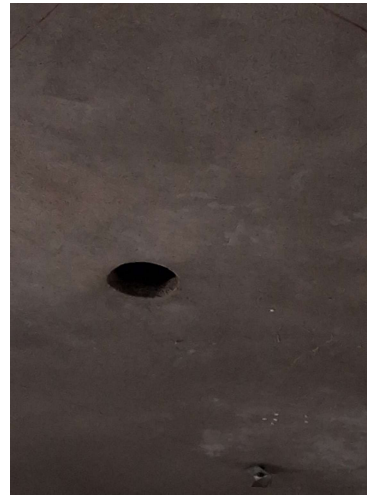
Dampness is observed on the slab through electrical conduit paths, and the continued moisture presence has led to deterioration of the slab. 1ST floor
